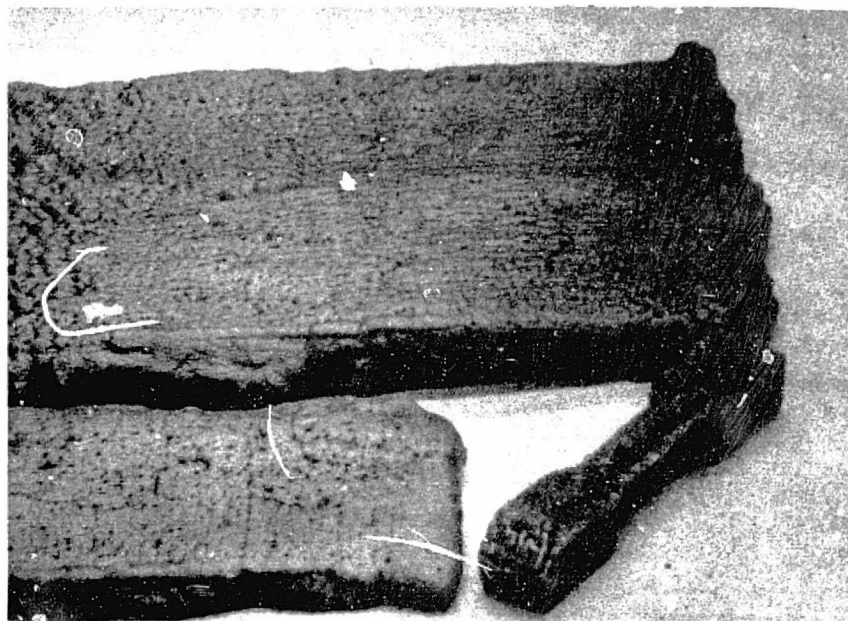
DIE CUT TENSION AND ELONGATION SPECIMENS FROM FLAT SHEET MATERIAL (Sheet 3 of 3)
